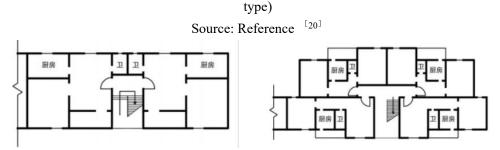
Typical floor plan of multi-storey residential building with staircases (left: two households per staircase, right: four households per staircase)
